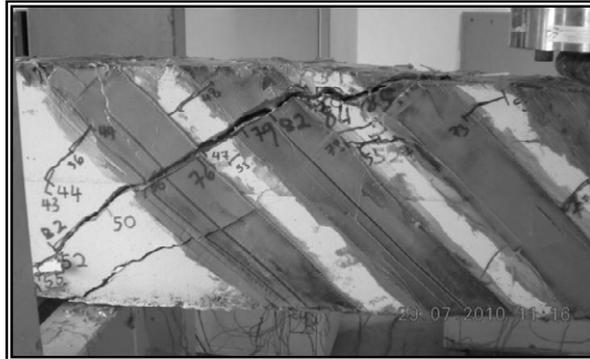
Shear failure of Beam 2-3 at load 411.25kN (shear force 134.68kN)
